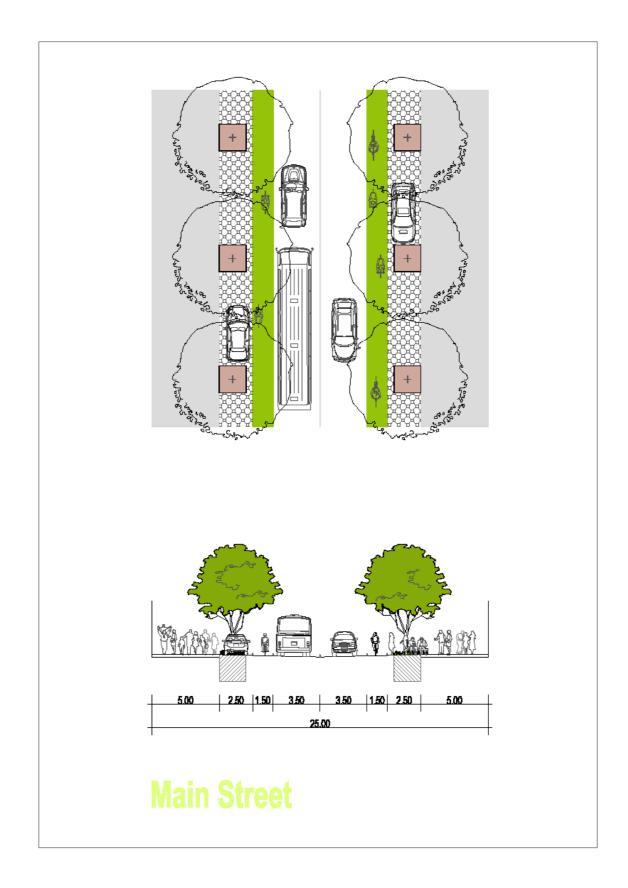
(c)(ii) Trunk Collector Road Type C Typical Cross Section
